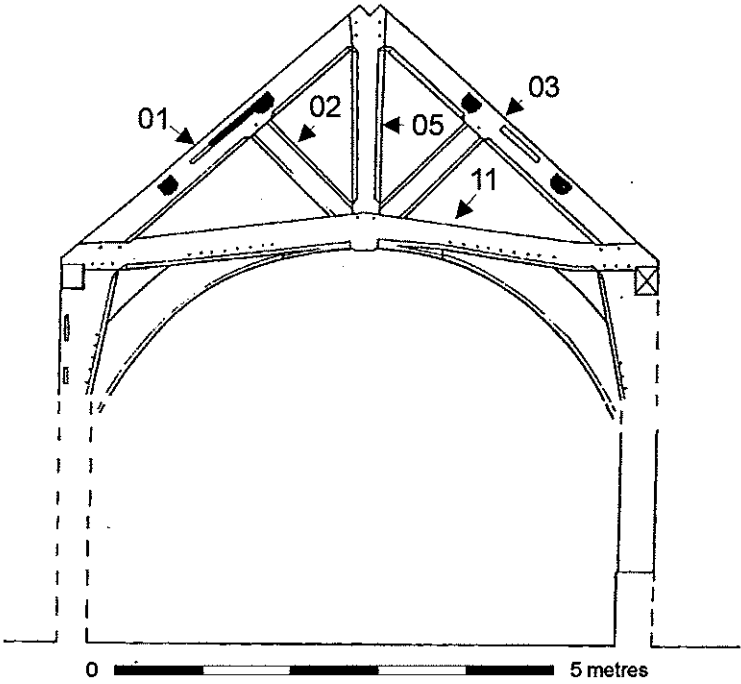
North-facing, idealised elevation of truss 3 (equates with section B-B1 in Corbett 1993) indicating sample locations
